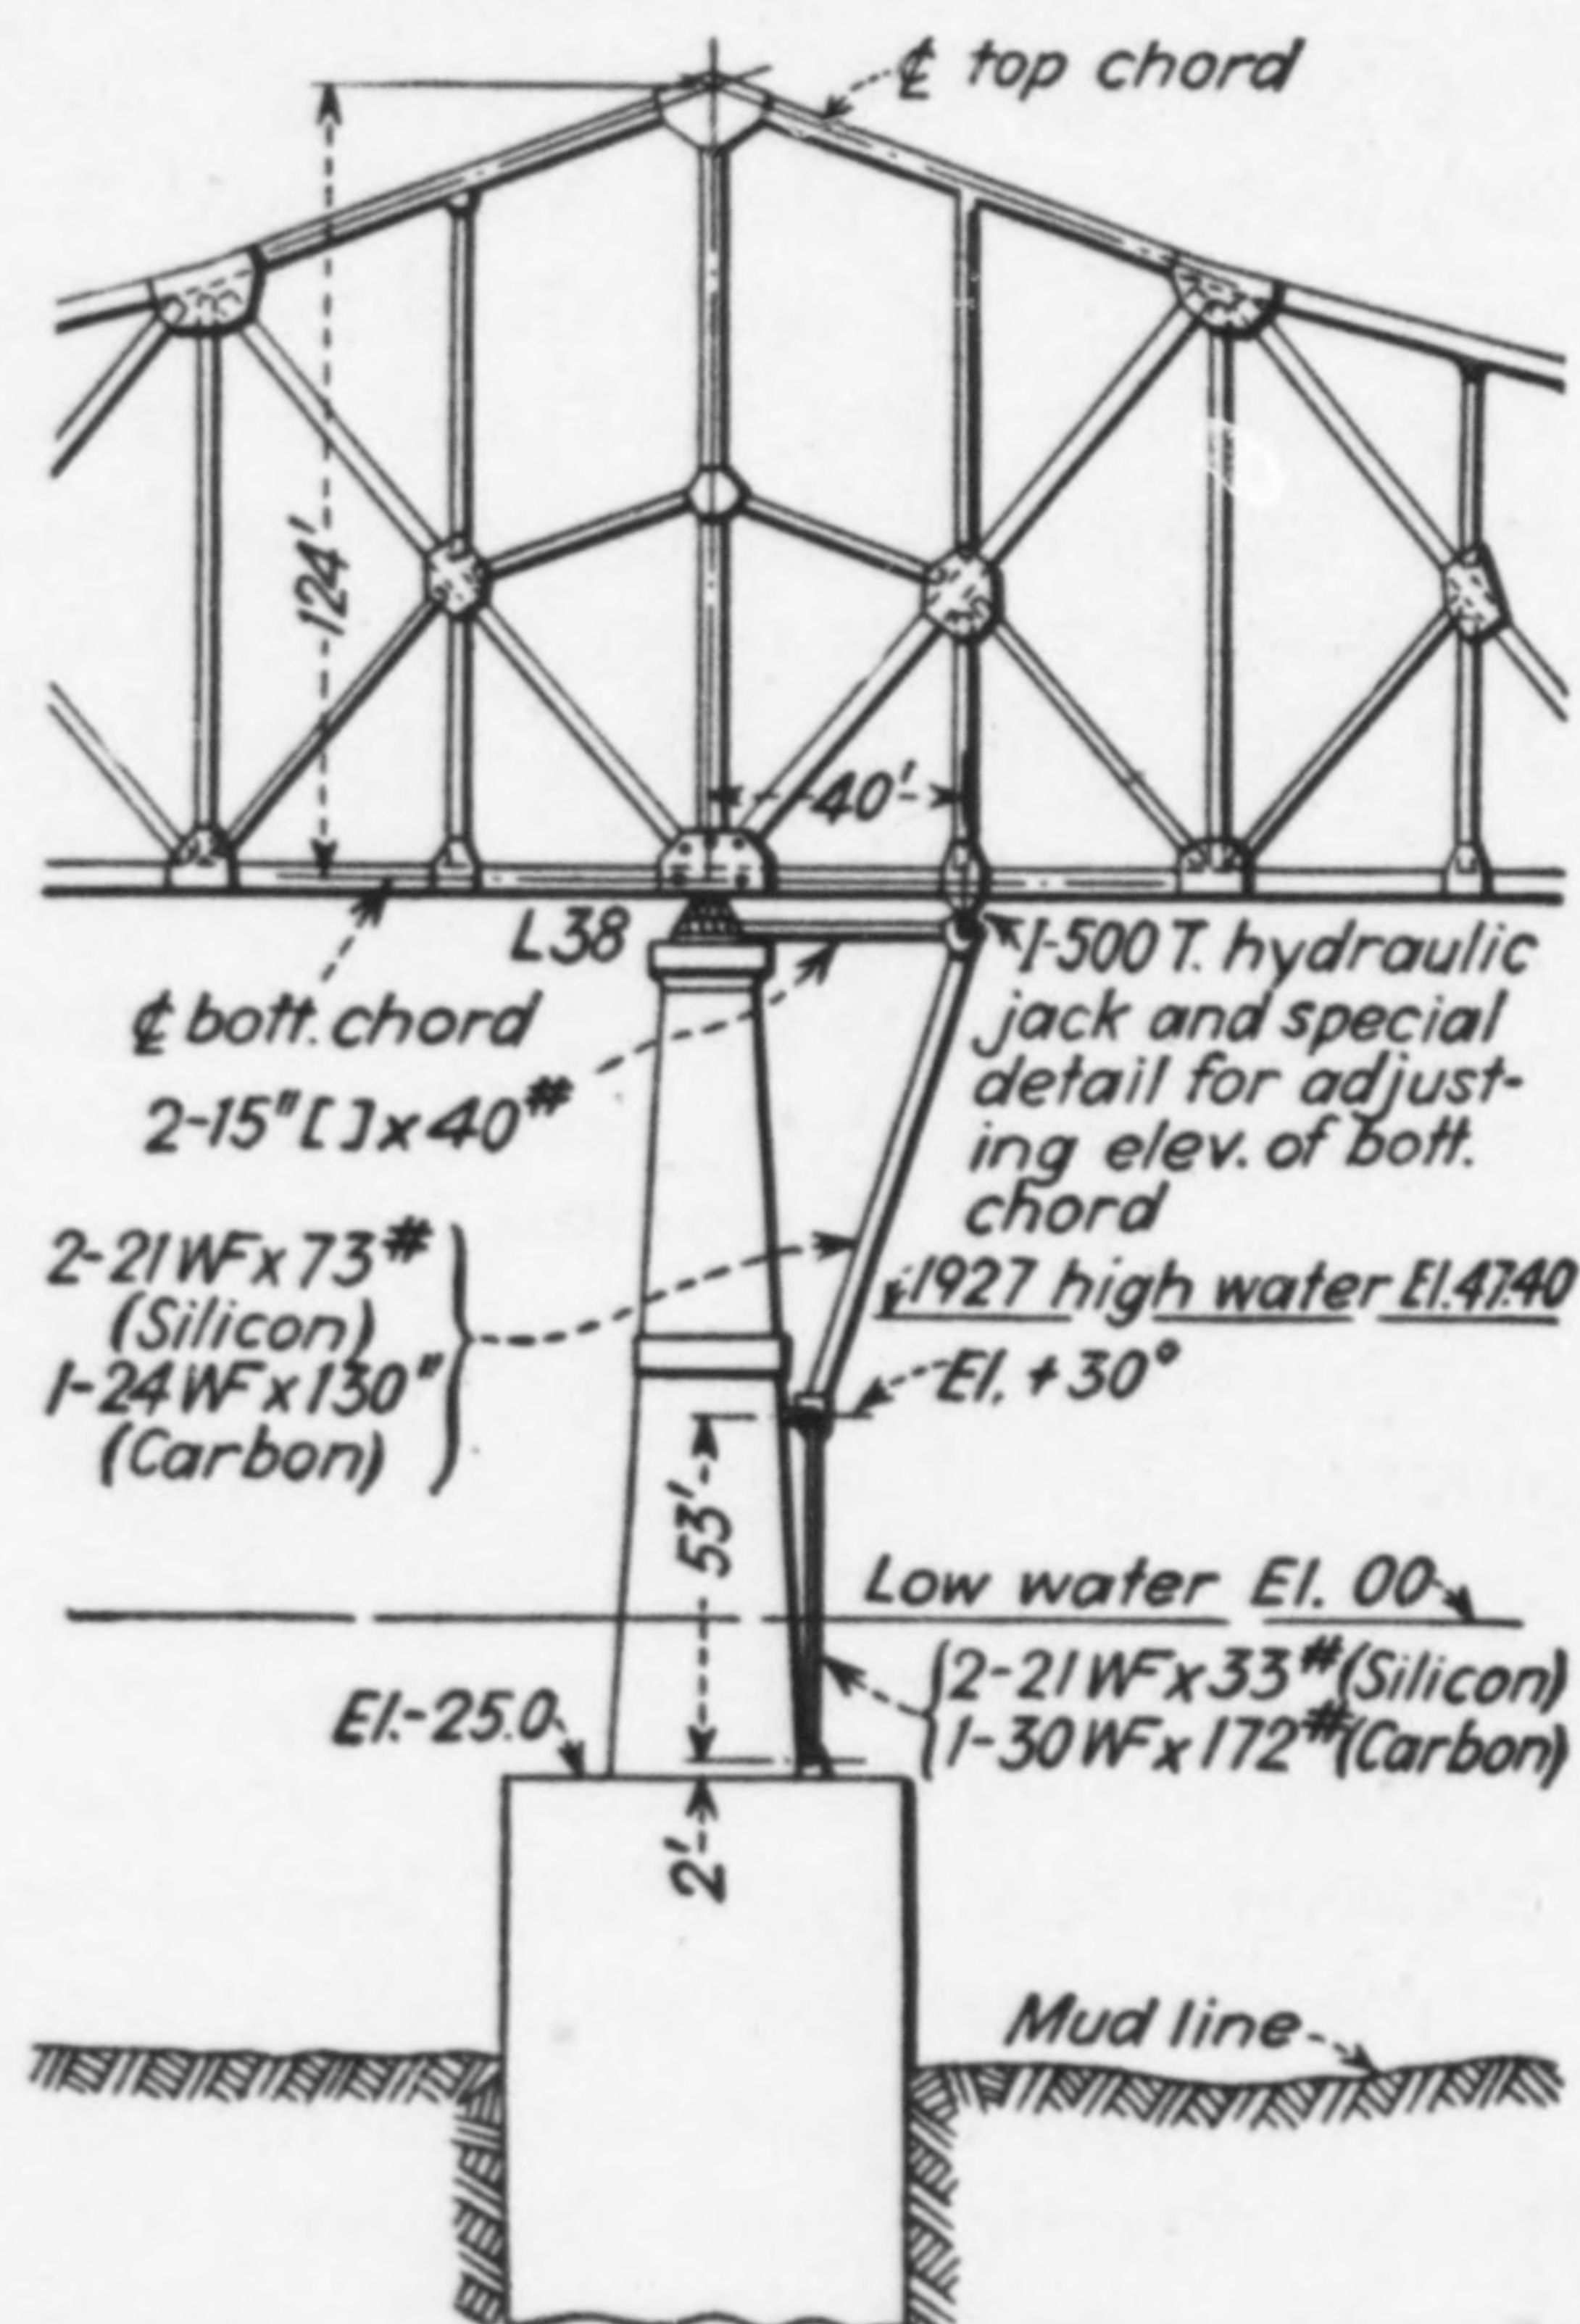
Details of the inclined falsework bent which supported steelwork for entire balanced cantilever erection over main piers.
